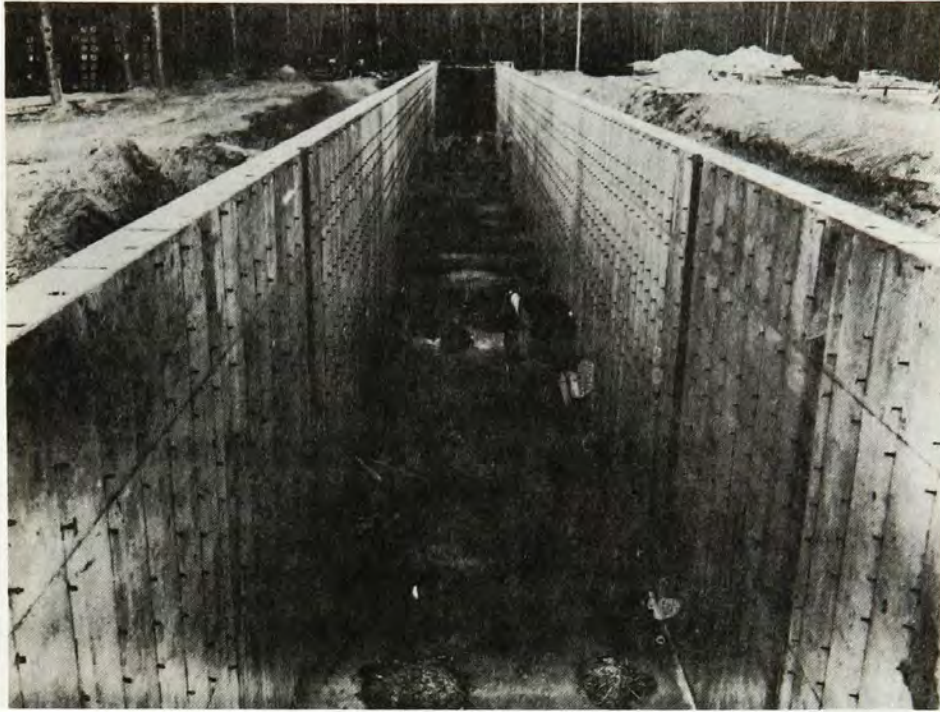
View looking down the 20-foot-deep, 635-foot tank toward area where generator will be located. On the right, shore processes test basin is under construction.
